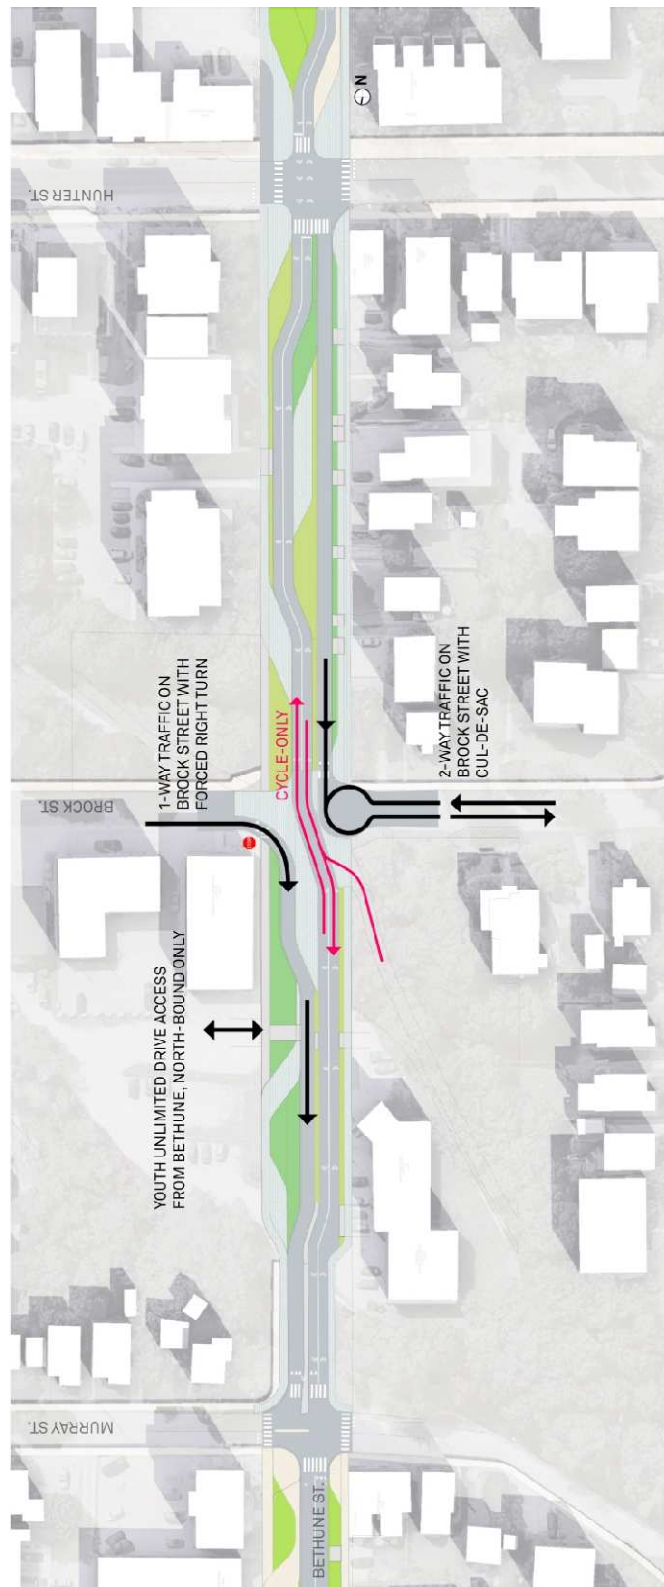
Bethunescape: Hunter Street to Murray Street Design
